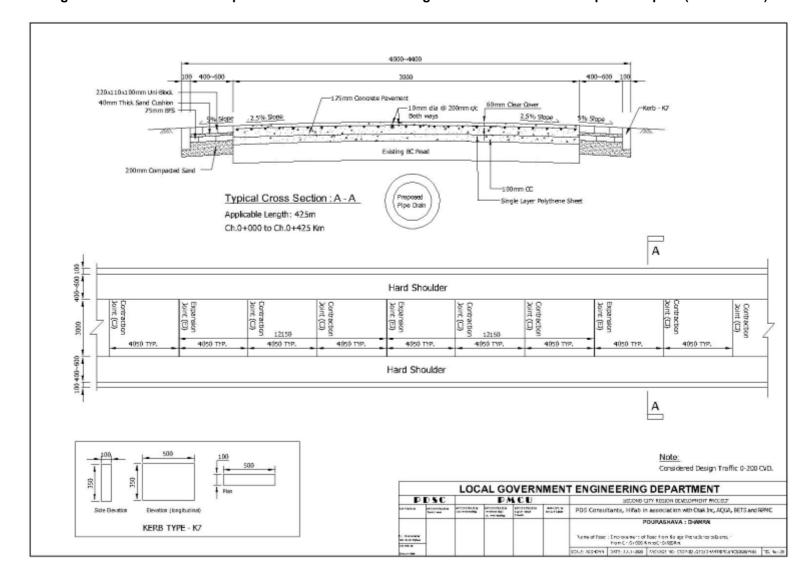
Cross section of Improvement of Road from Rice Mill To Bangshi River at Kumrail (Ch.150 - 465m)
